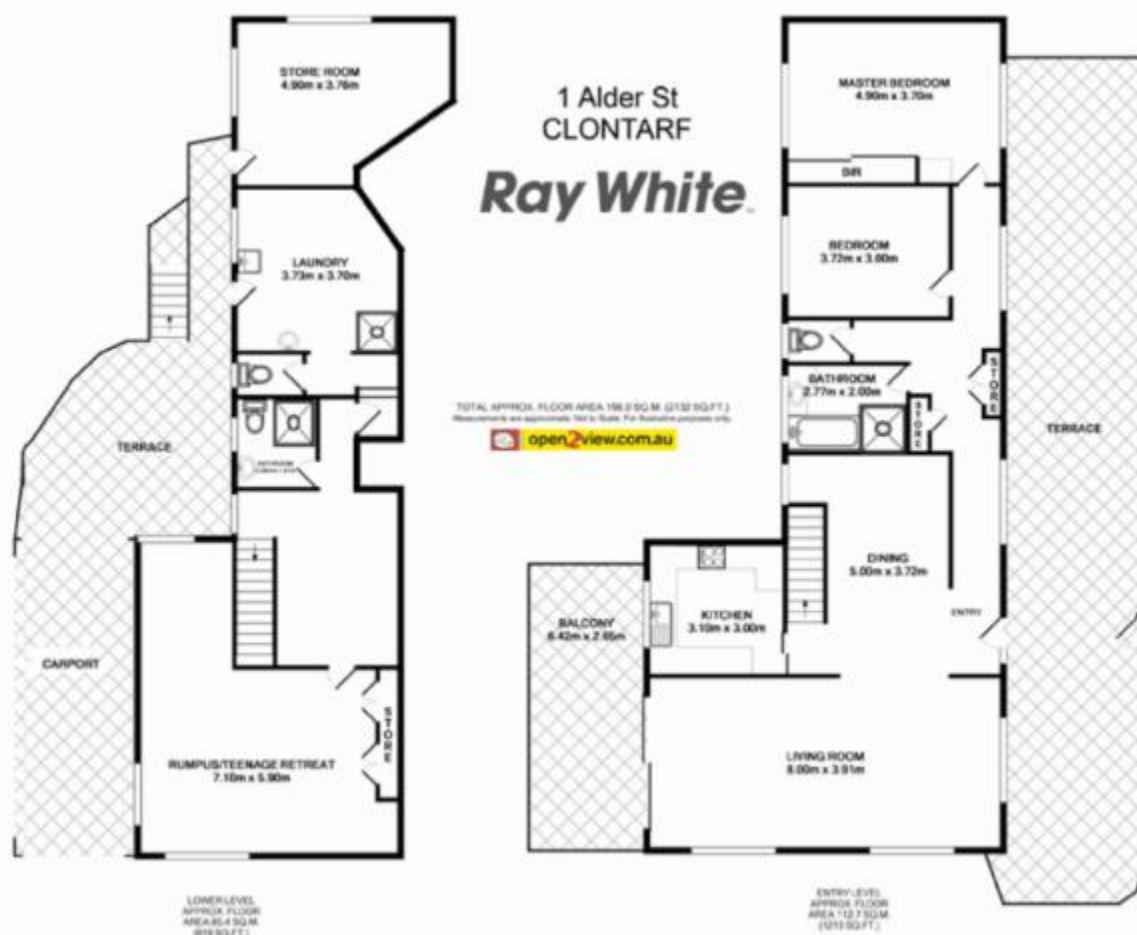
Floor plans of 1 Alder Street, Clontarf obtained from realestate.com.au
